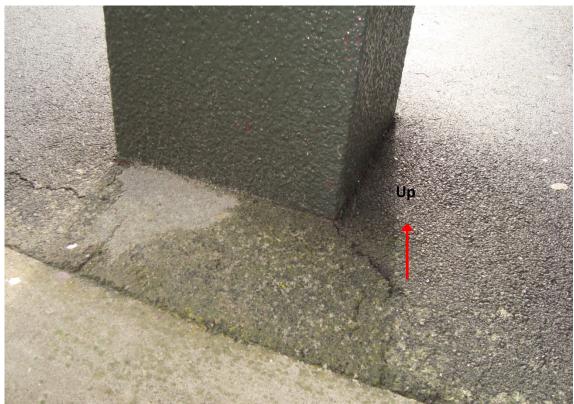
Some minor cracking (2mm wide hairline crack) on wash down area (east elevation).
